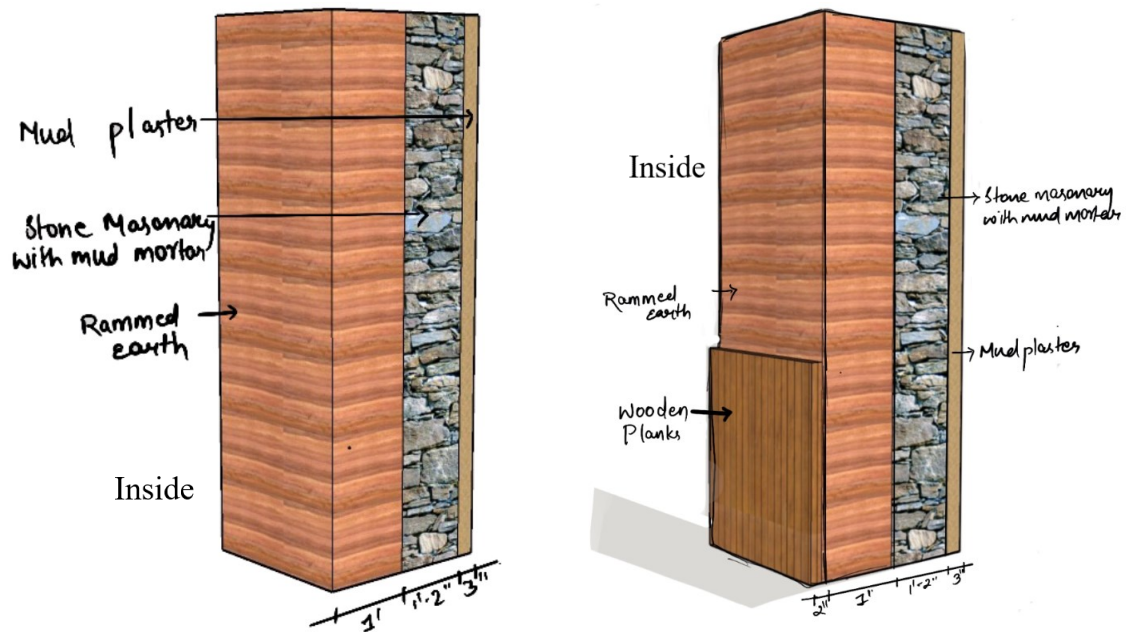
Composite wall w/o wooden plank Figure 5.2 Composite wall with a wooden plank
